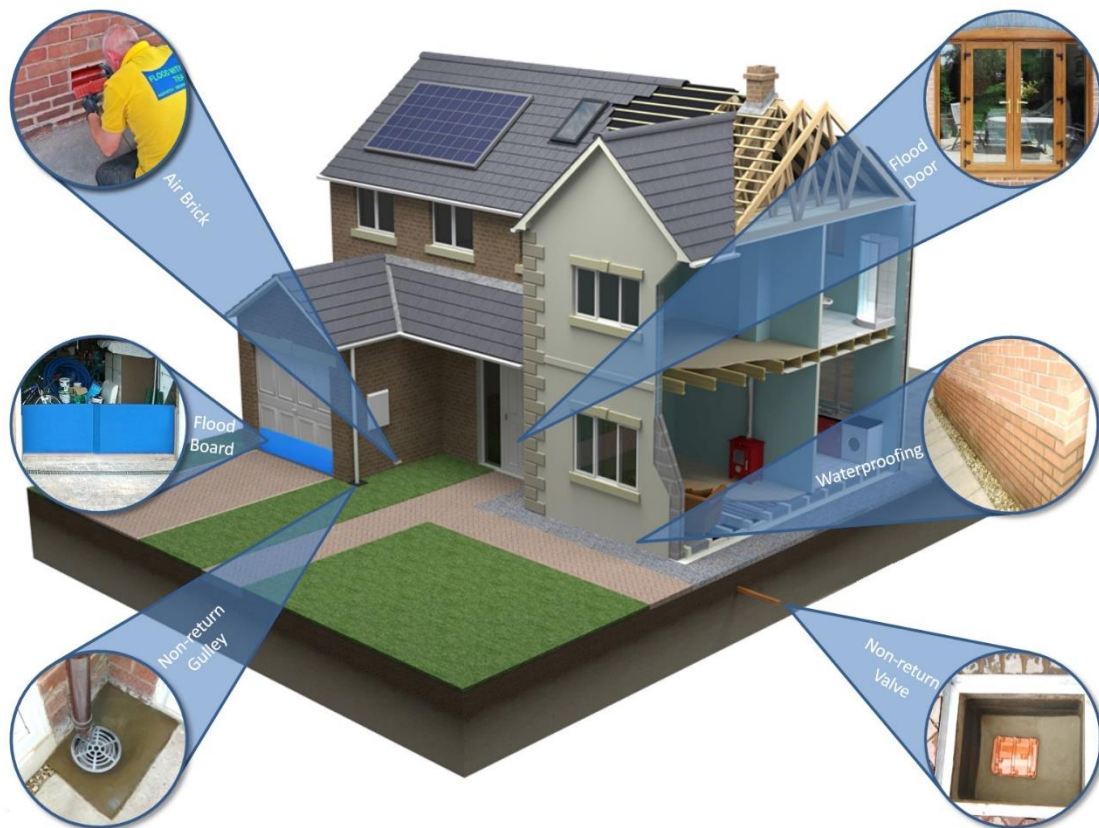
Whitehouse Construction 'Mainstreaming PFR'
